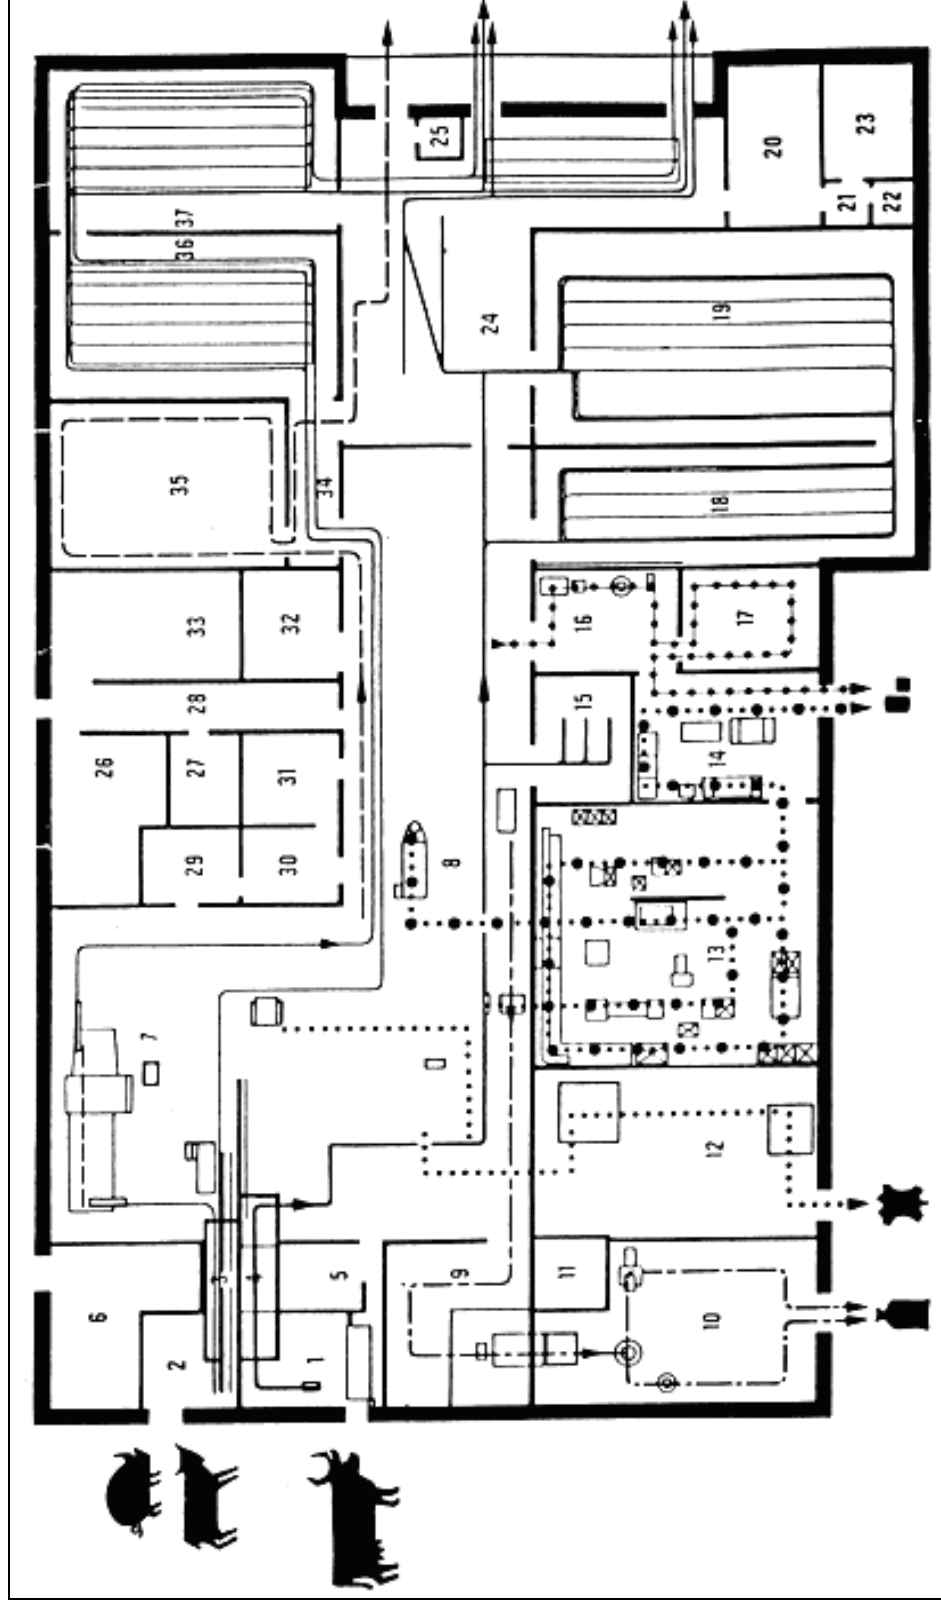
Example of the layout of a typical sheep, cattle and pig slaughterhouse.
